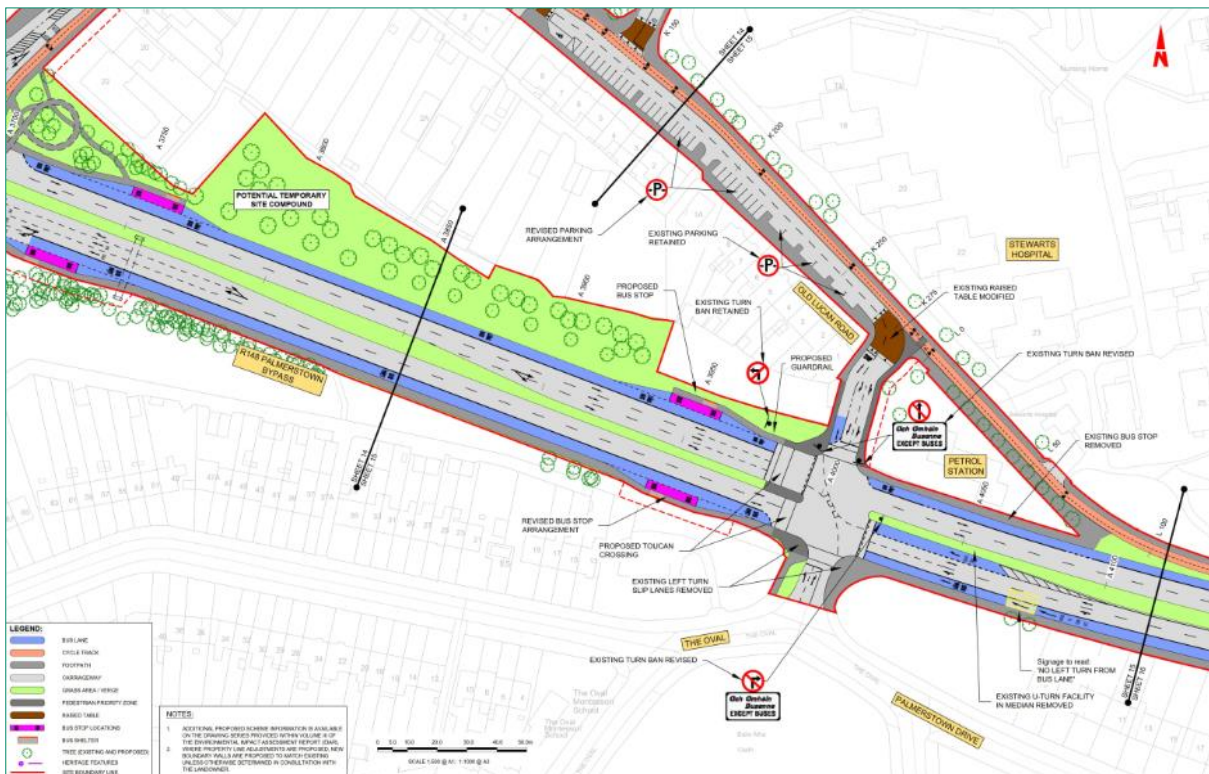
Extract 5 from General Arrangement Drawing (Sheet 15)
